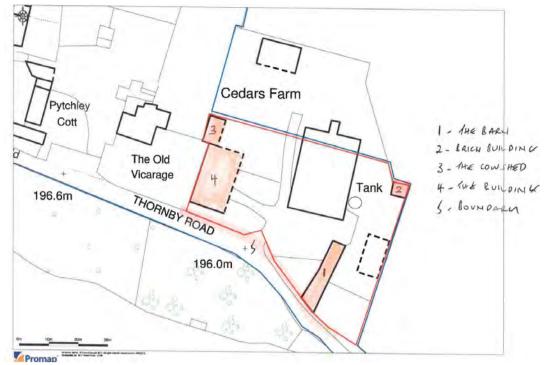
Site plan with affected buildings highlighted Plan supplied by Client
